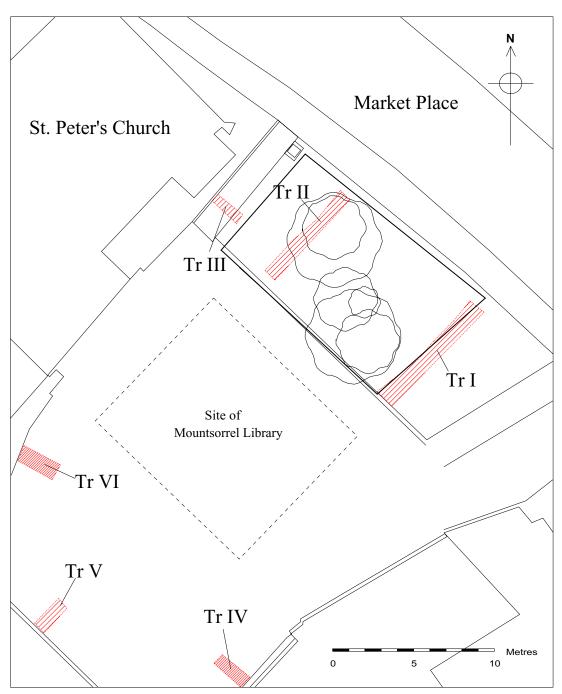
Plan of proposed development showing position of the trial trenches and area where the strip plan and sample excavation is required.
